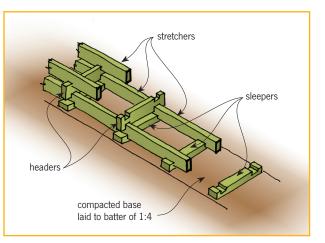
Proprietary timber crib walling. Total height to manufacturer's requirements.
